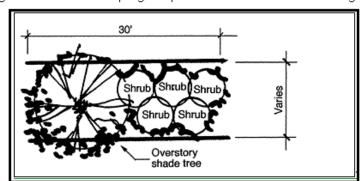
Landscaping Requirements - Perimeter Parking Areas
